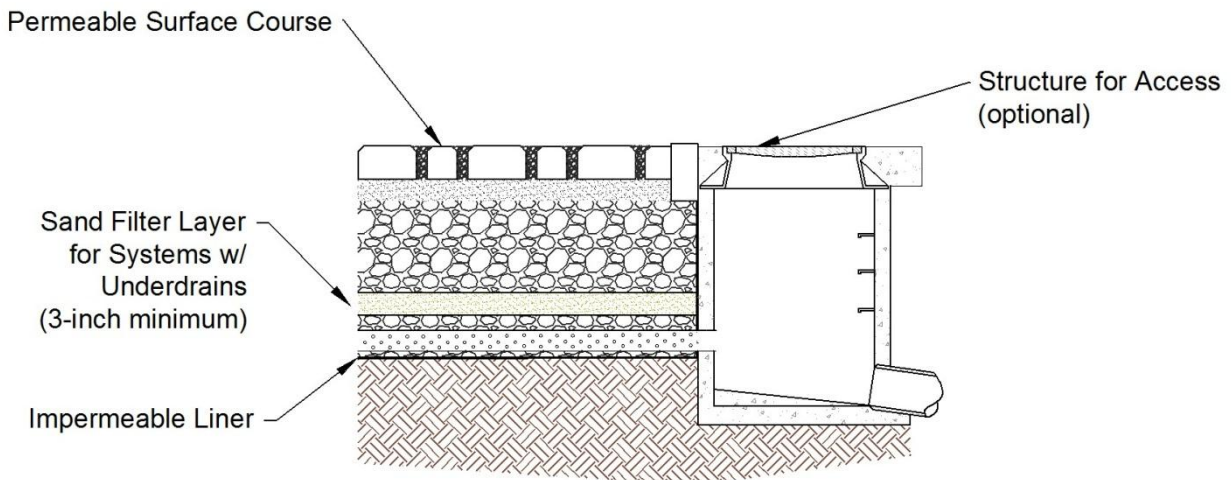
Configuration 4 – Filtration permeable pavement with impermeable liner and underdrain on the subgrade.
